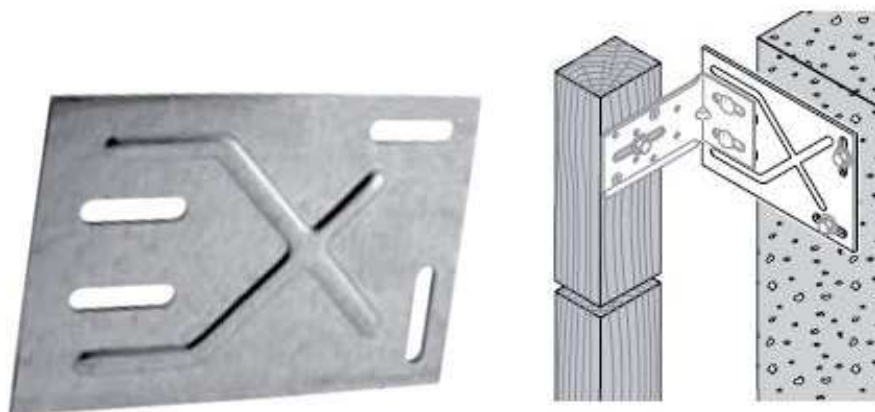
Auxiliary angle plate, galvanised steel Z350. Thickness: 2.5 mm
